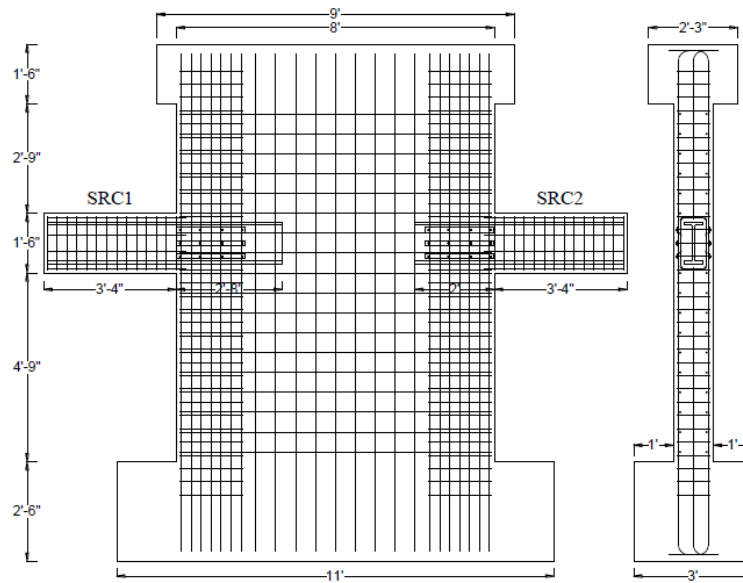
View of Complete Test Assembly (Motter 2014)
